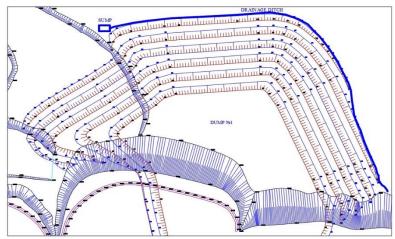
Layout of the projected dump No. 1 and the drainage system.
